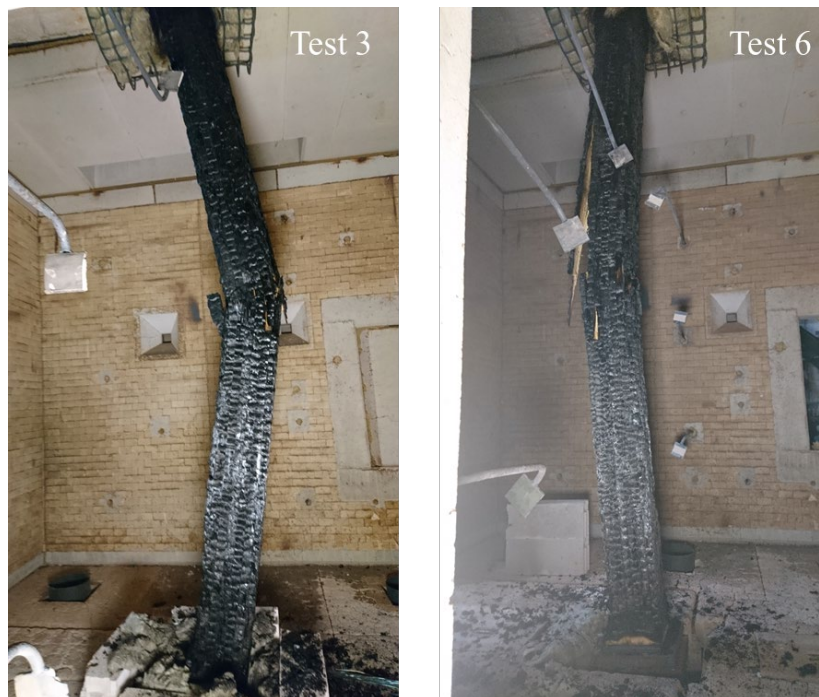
Two timber column specimens in the furnace after failure (Gernay et al., 2023)
